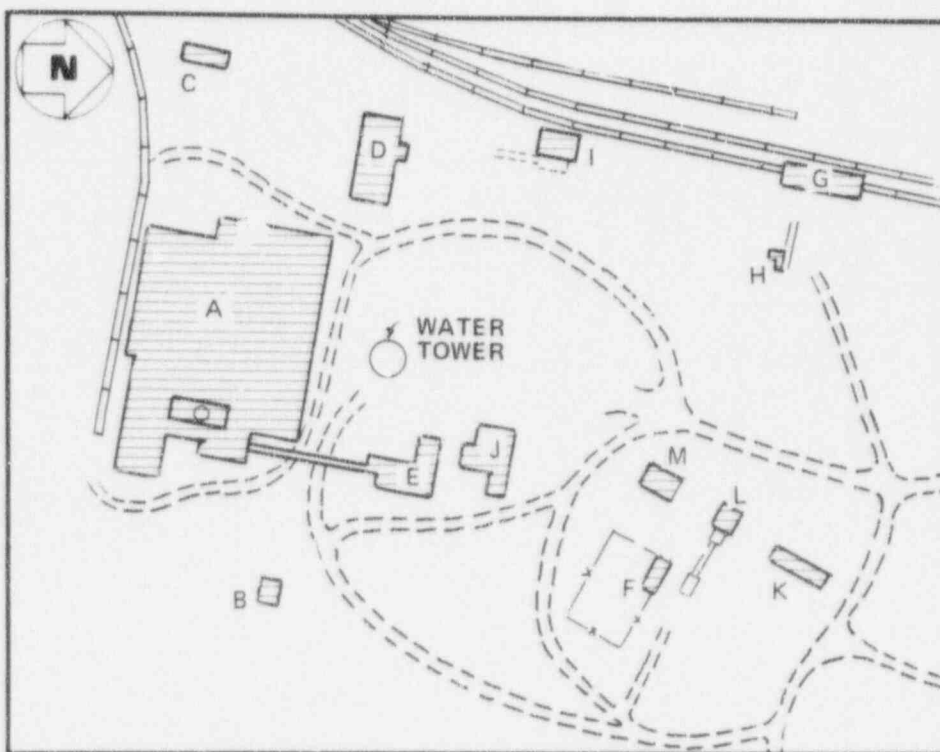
MILLSITE BUILDING LOCATIONS
